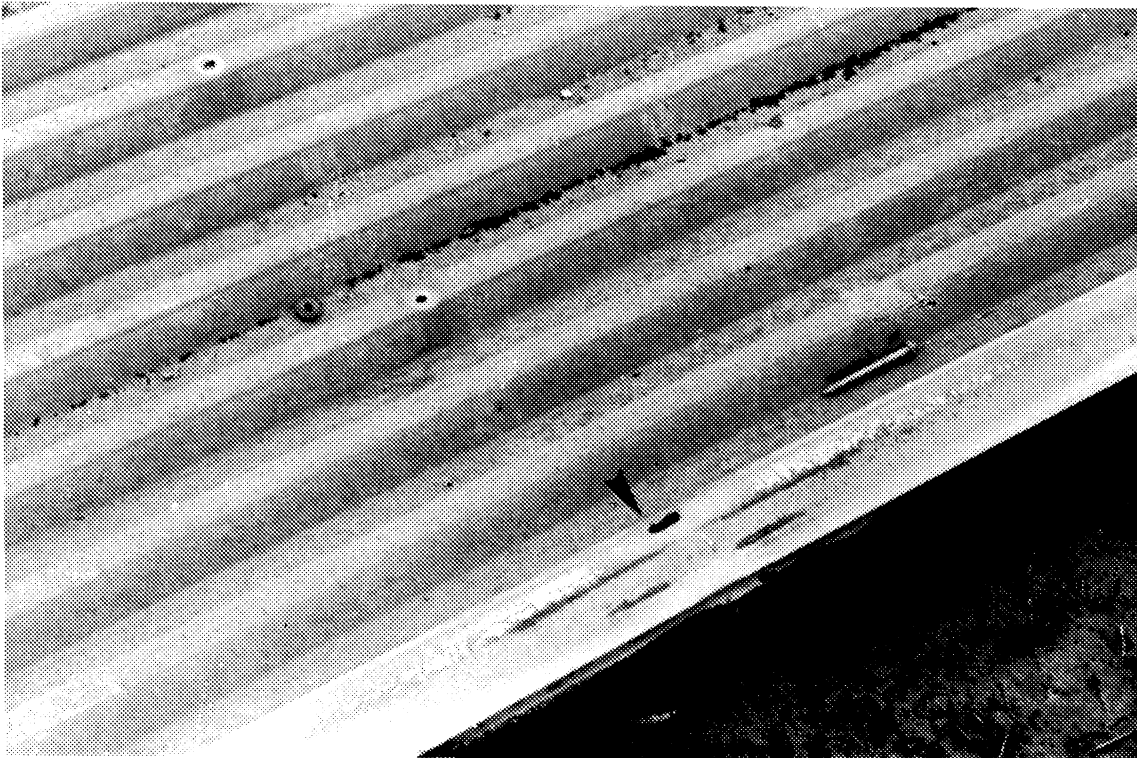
Detail of roofing from kindergarten. Note slotted holes at lap.
